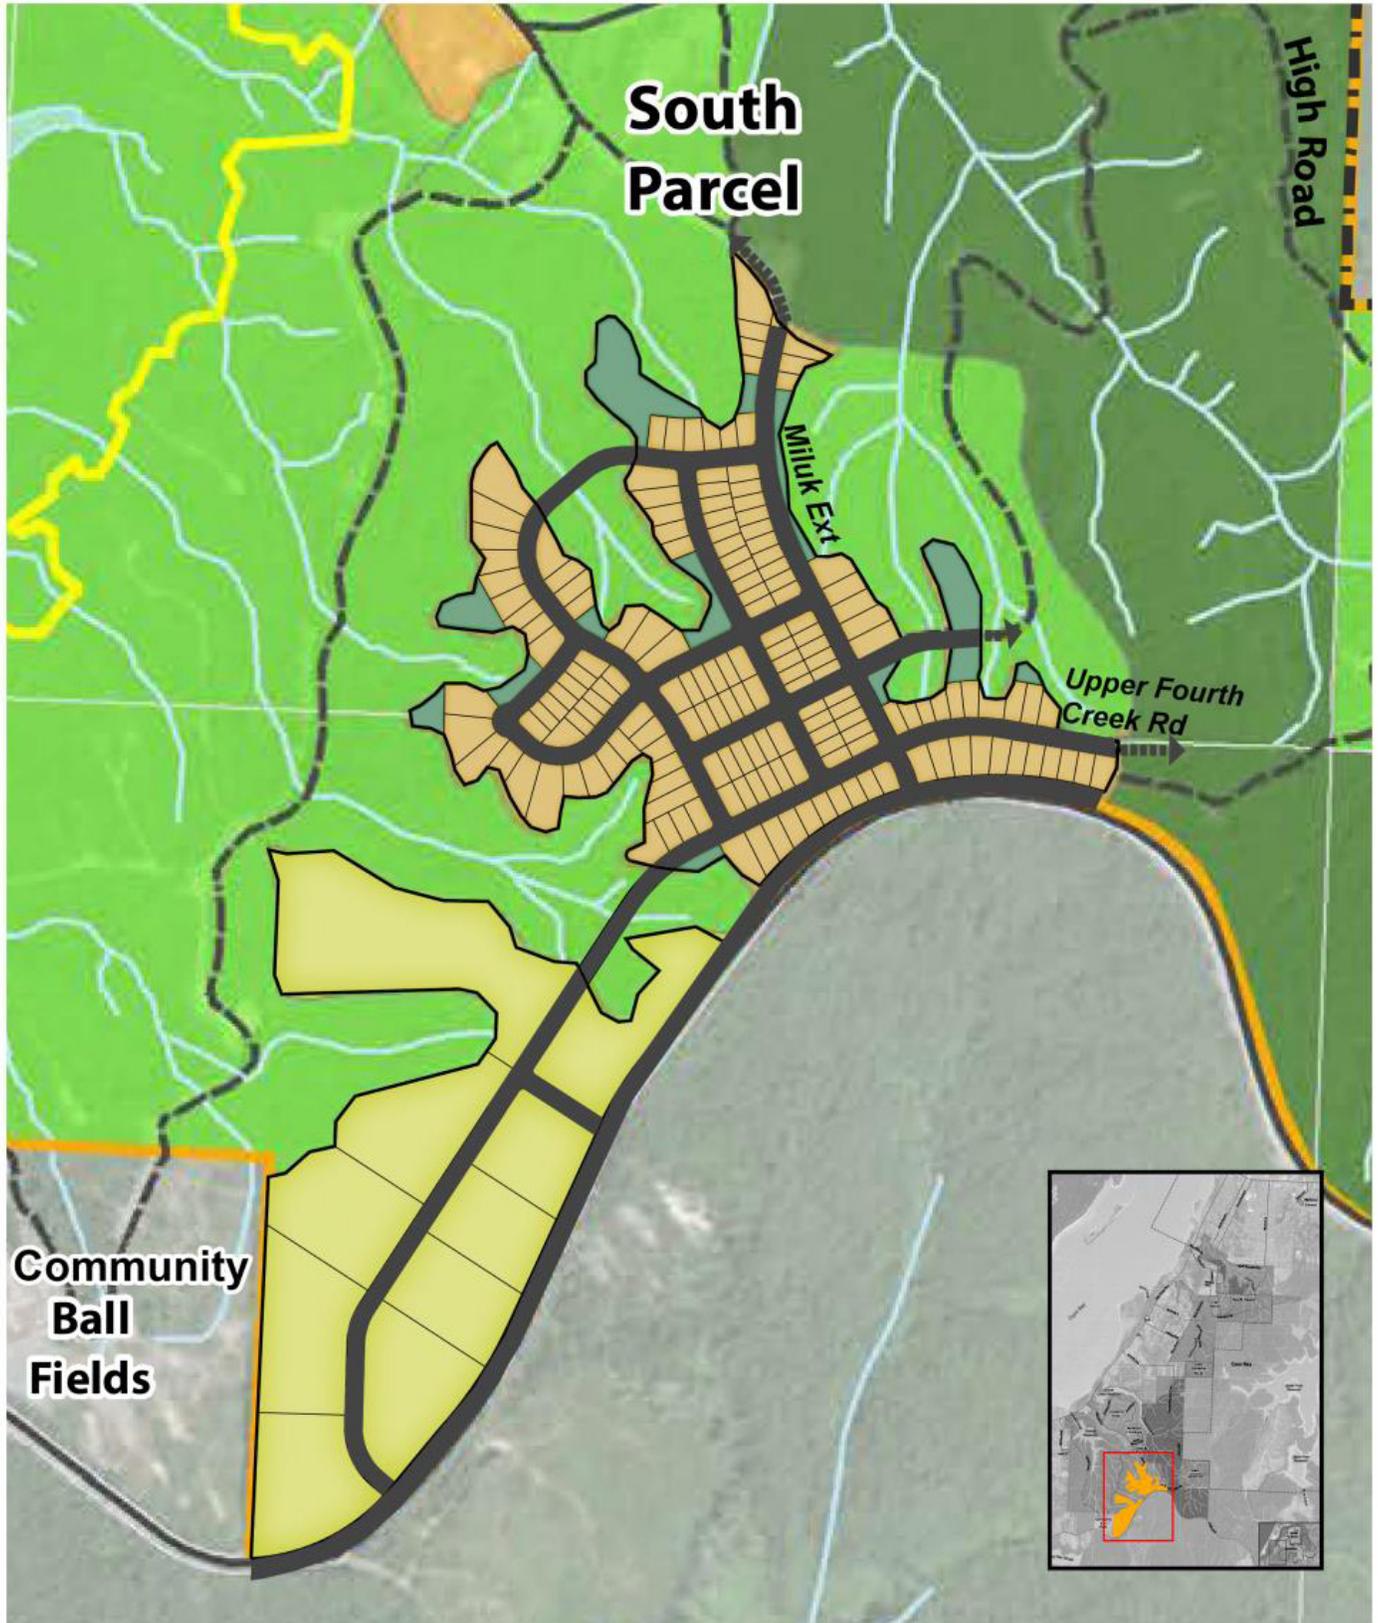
Preliminary Site Plan: Area E-East – Northeast and Southeast Zones
